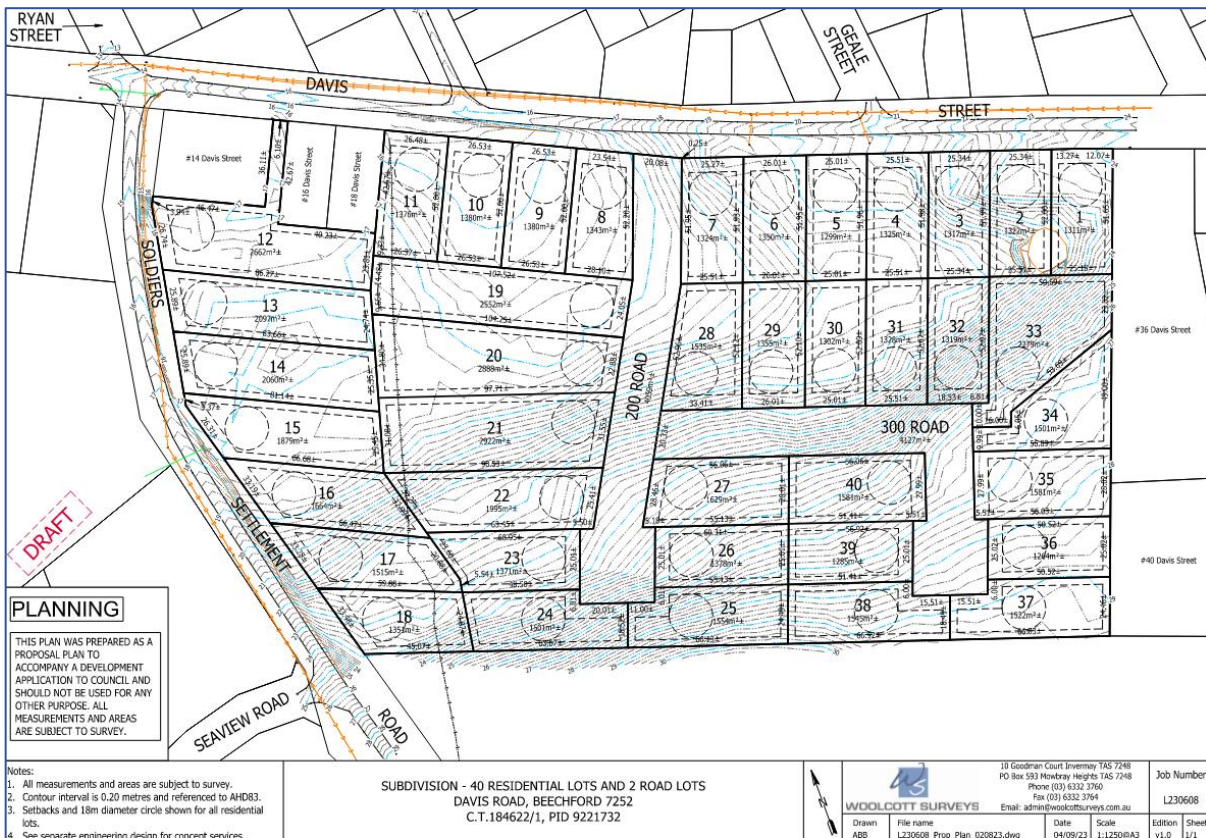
Plan of subdivision (Woolcott Surveys, 2023).
